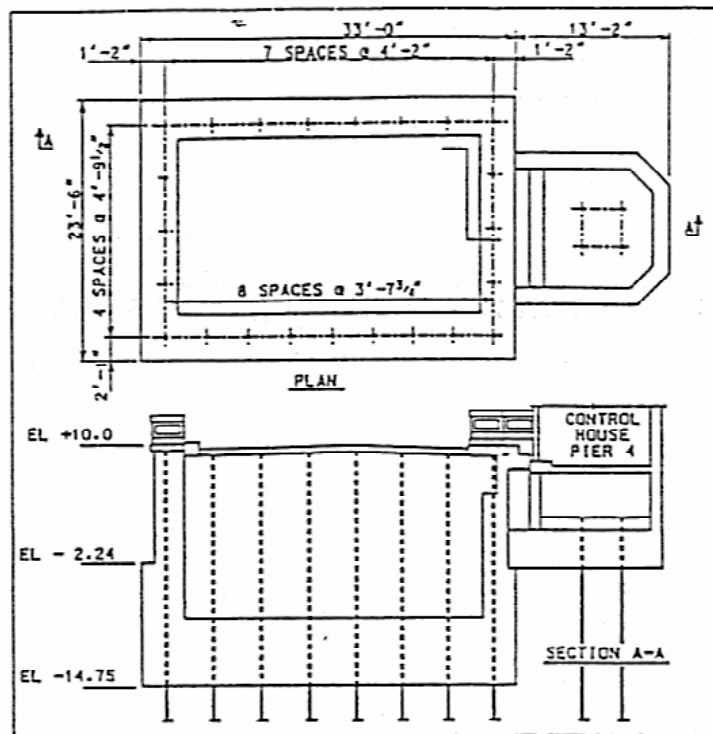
Plan and Section of Bascule Pier #4 showing pinpile locations, Pocomoke River Bridge, MD (Bruce et al., 1990).
